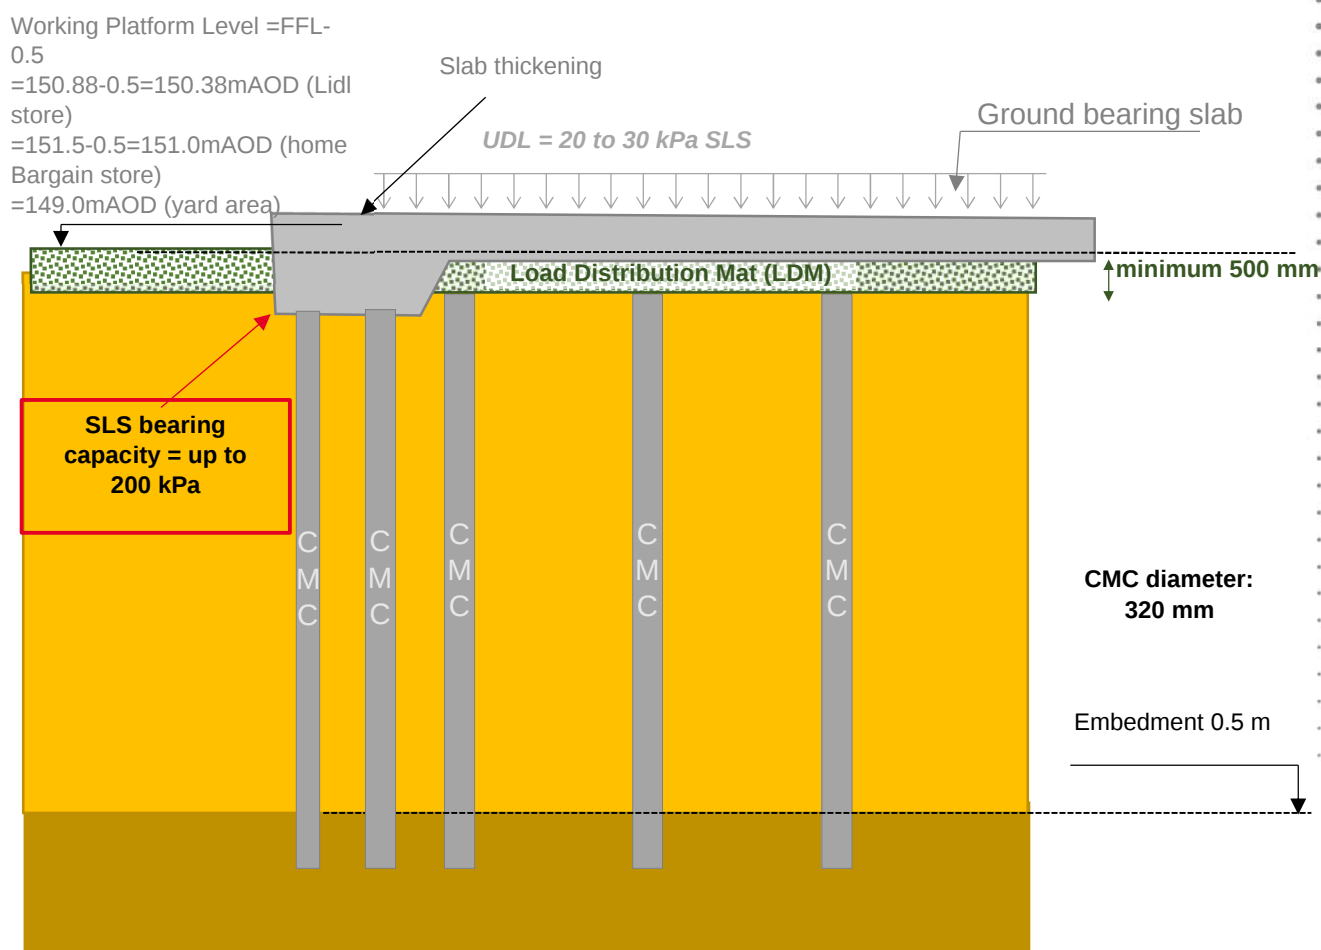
Typical cross section of slab thickenings and ground bearing slab on CMC
